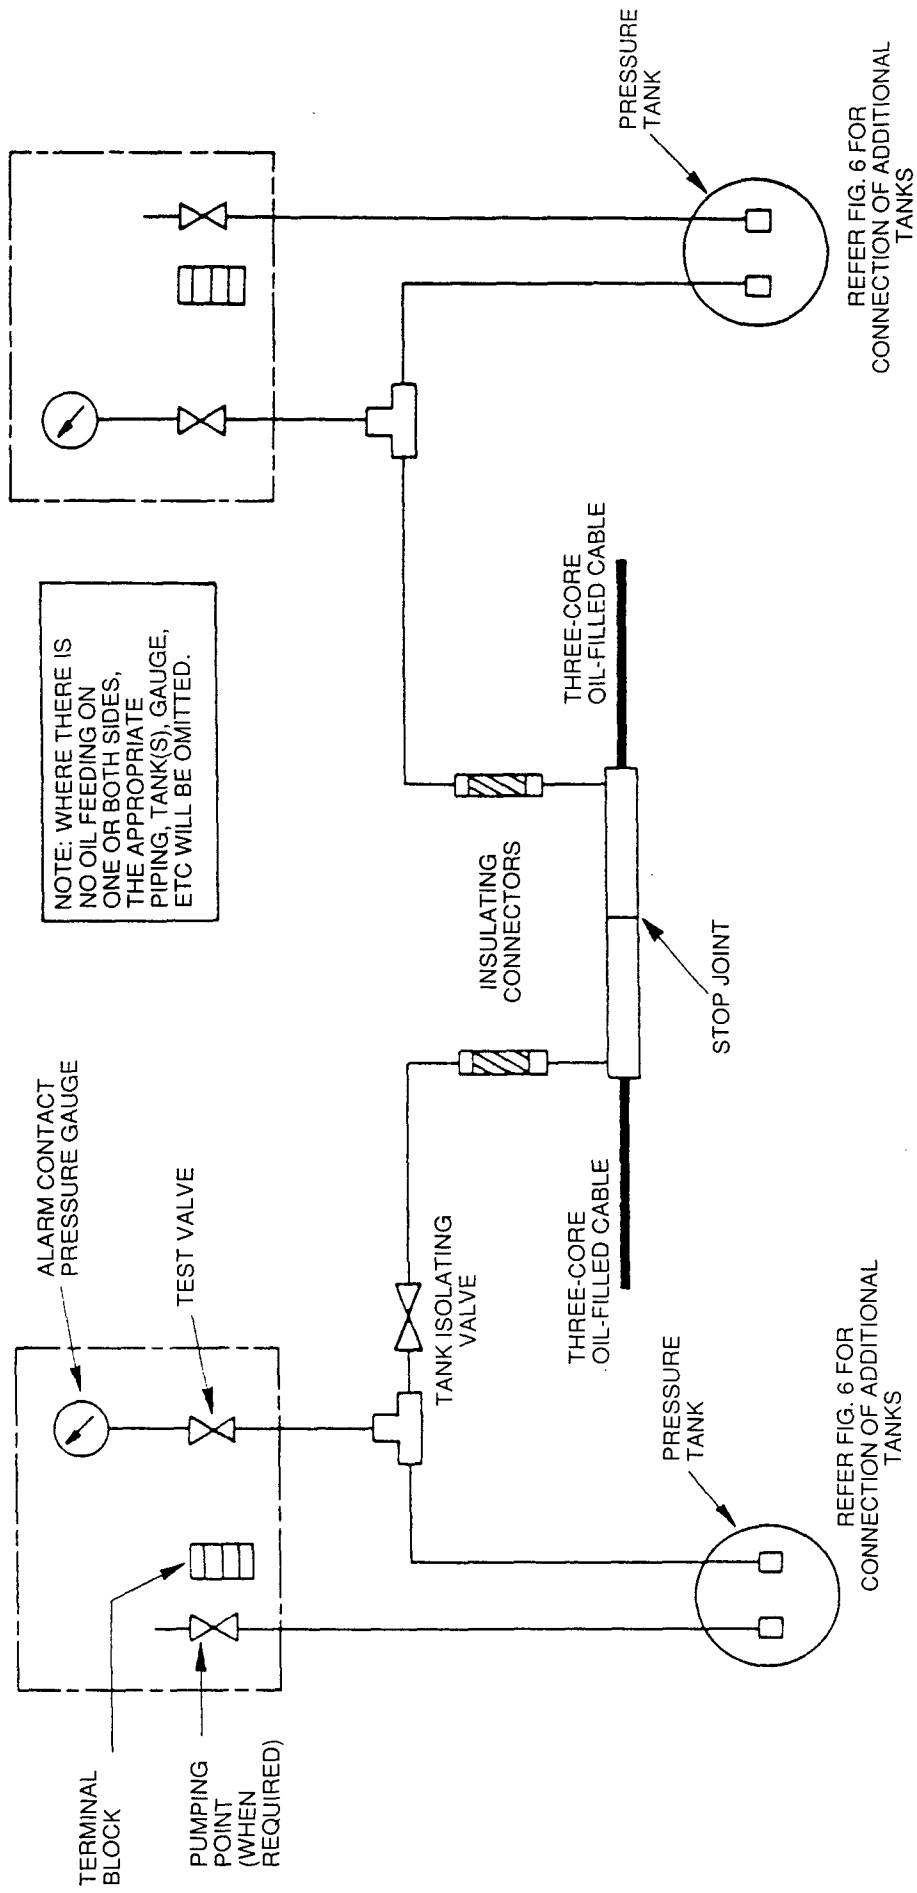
Arrangement of Oil Equipment at Three-core Stop Joints (Oil-filled Cable)
